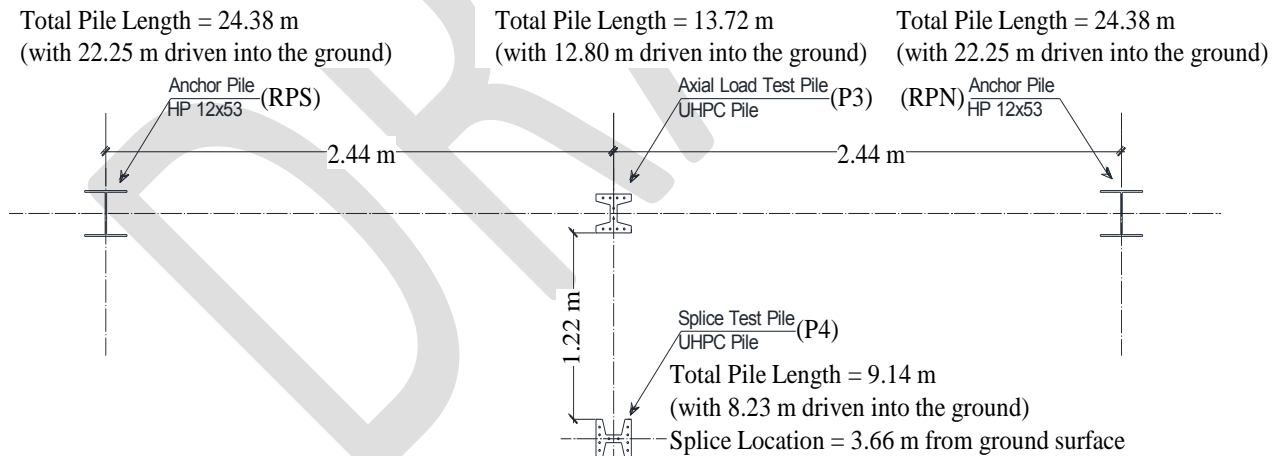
Location of test piles P3 and P4 as well as steel anchor piles RPS and RPN
